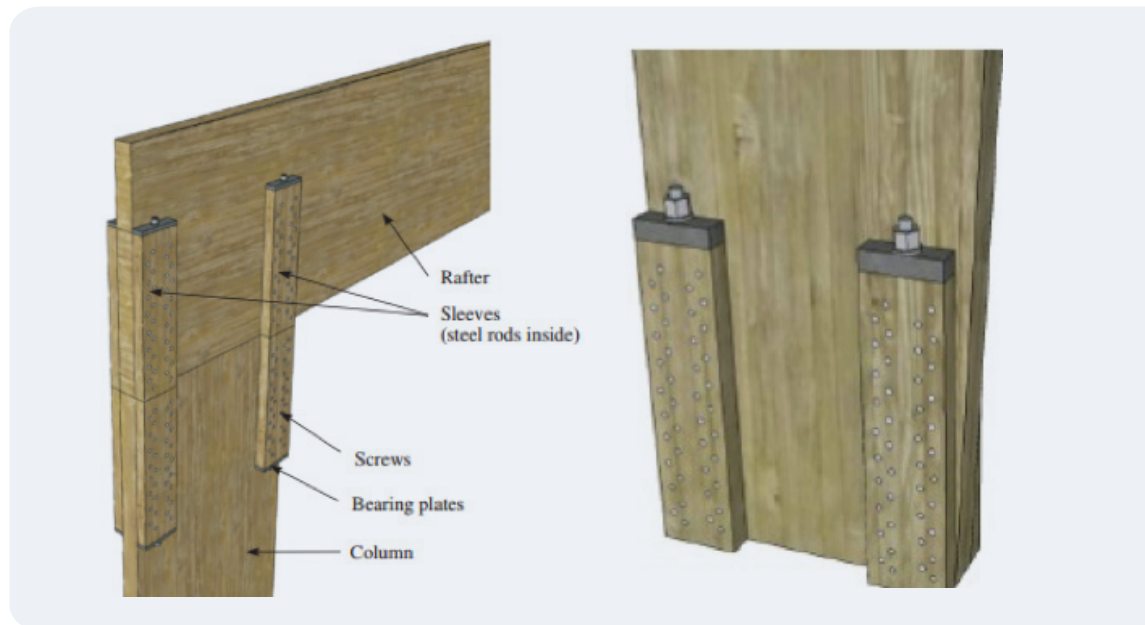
Quick-connect moment connection as knee (on right) and column to foundation joints (on left).
